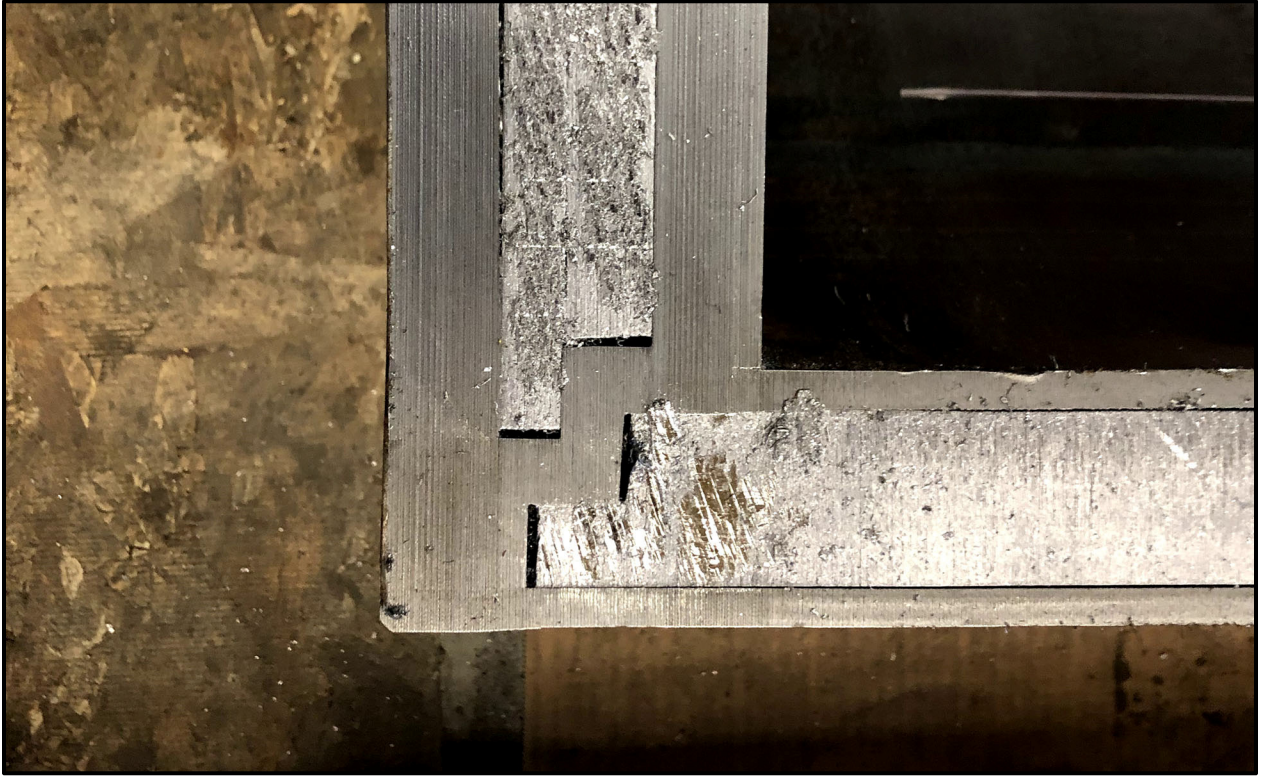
SC-30G2 18TU-02 Destructive Disassembly Cut T/U at Lower Flange
